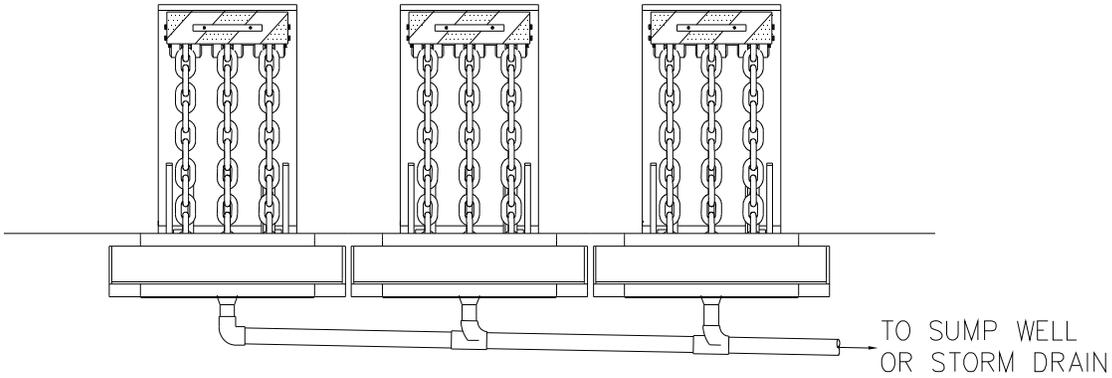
DSC2000's as typically installed in a level roadway. The drain fittings are located in the lowest part of the Barriers' drain pan as installed. This may be to the center, the front, back, left or right. There should be no standing water left in a properly installed DSC2000 Barrier.
